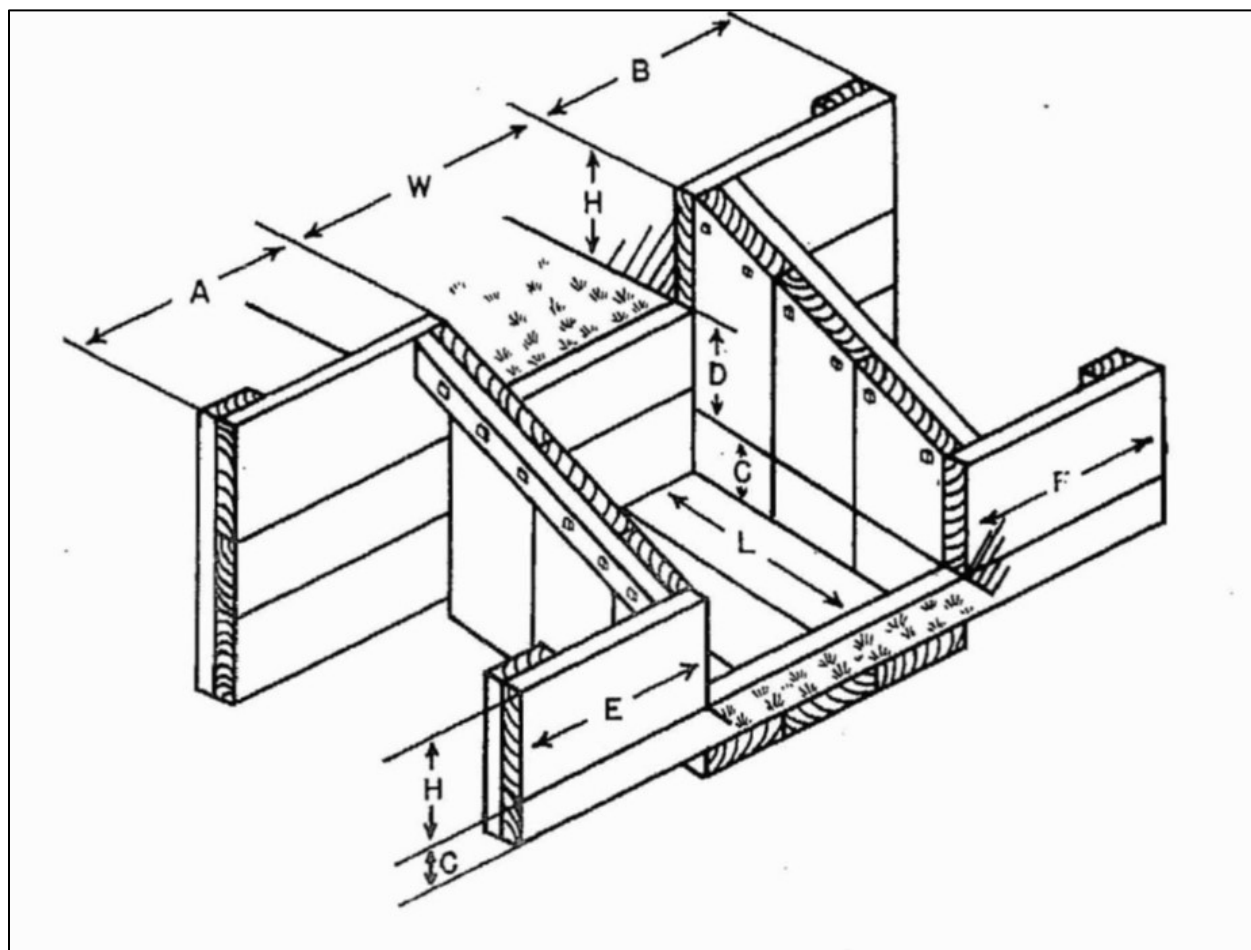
Wood drops are constructed in a similar shape to a concrete drop.²⁸⁰
